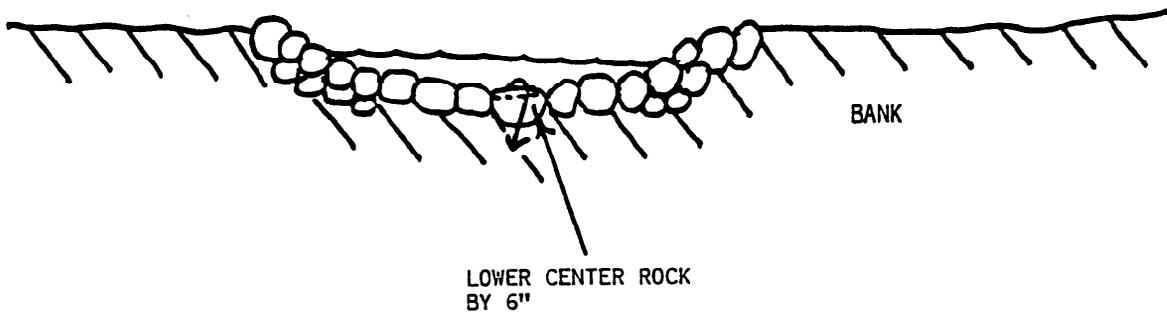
Illustration of Rock Weir Dam. For controlling water surface elevation and stabilizing bed. Potters Pond Enhancement Project, 1987.
